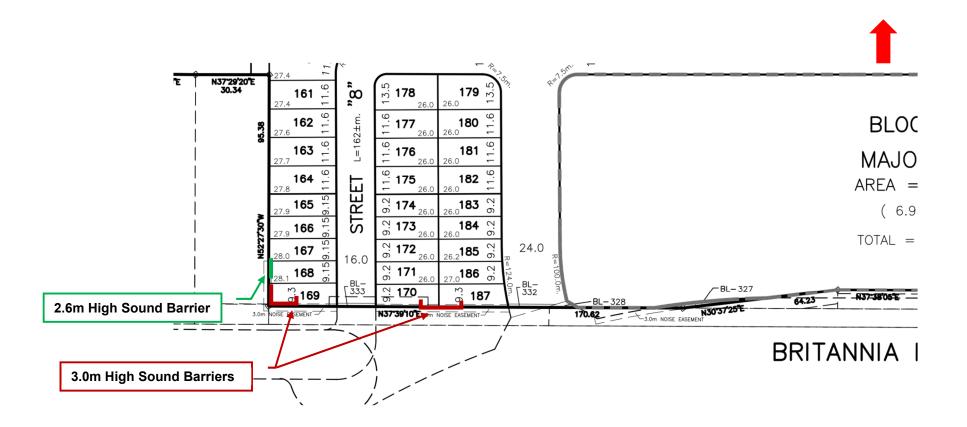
DRAFT PLAN OF SUBDIVISION
